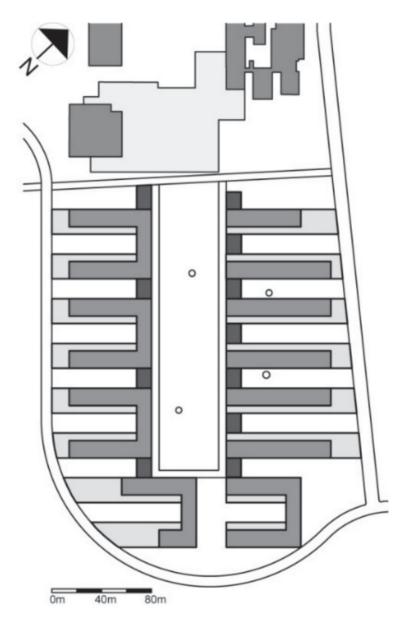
Grey: ZDES Departments desirable area; light grey: maximum area; dark grey: "commonplace" construction range.
